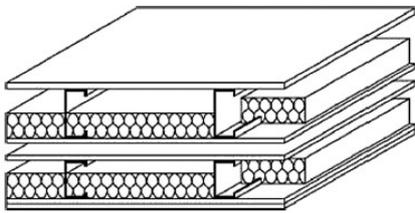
Light steel joists for ceiling with next floor on top (Lawson et al).
